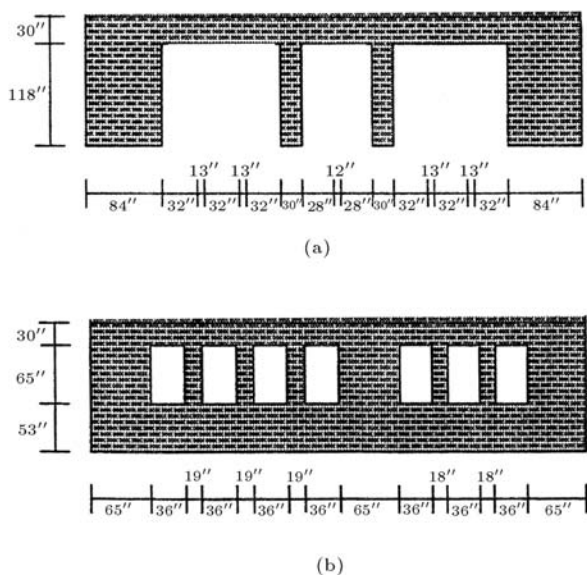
Elevations of the 1-story unreinforced masonry building in the study by Abrams and Shinozuka [6]; (a) Door wall; (b) Window wall.
